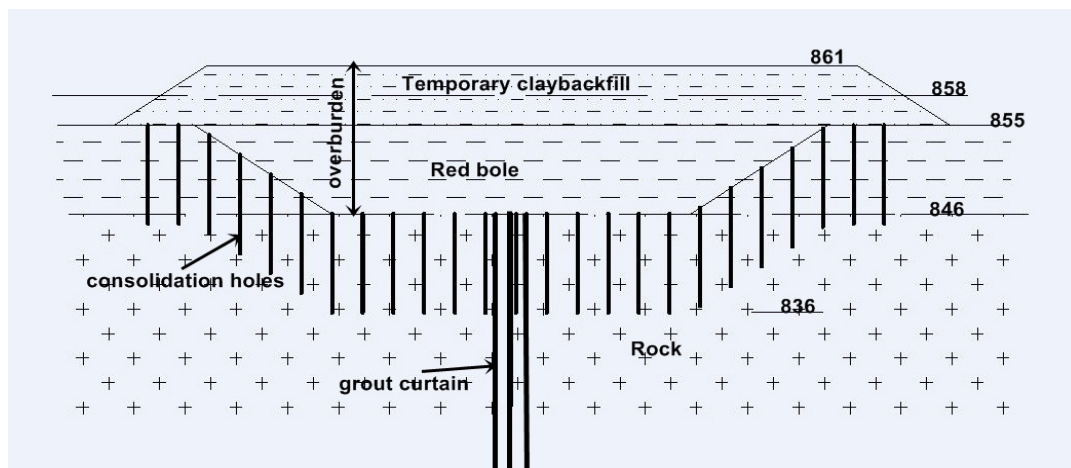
Temporary Claybackfill at the riverbed section for grouting before excavation
